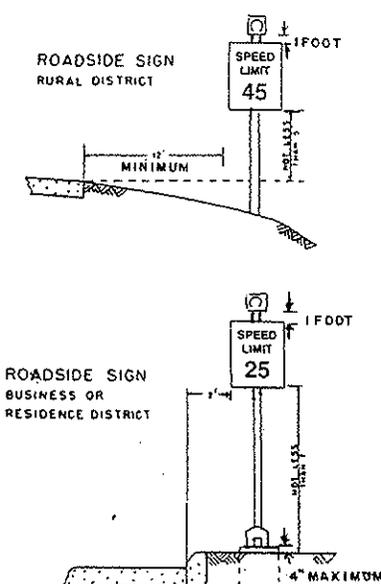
Standard Flashing Beacon Installations for Rural & Urban Districts
